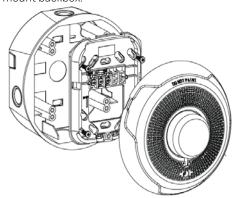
2-Wire Ceiling Mount Horn Strobes with Ceiling Surface Mount Backbox
